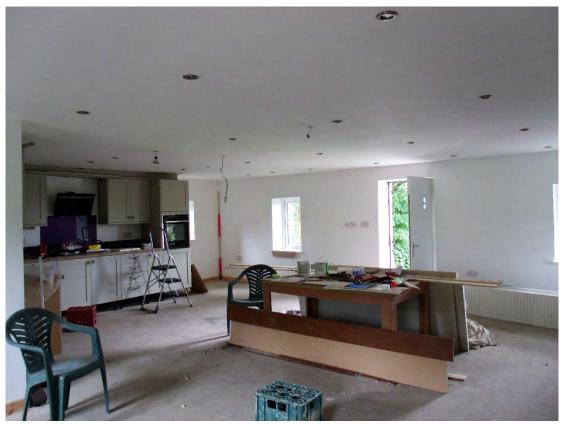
Interior, ground floor; view towards SE. 2m scale.
